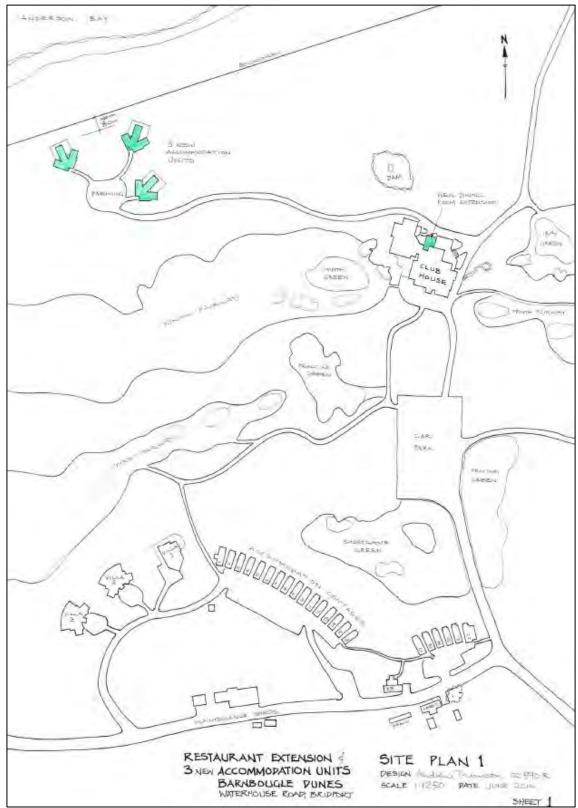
Site Plan of existing visitor accommodation, club house, and wellness centre within the existing Barnbougle Dunes golf course (source: Thompson 2014)
